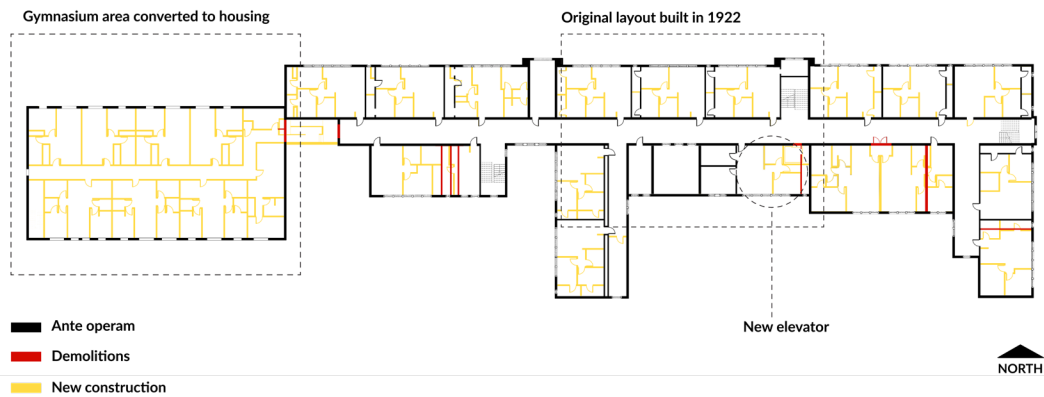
Second floor demolition and new construction plans of Dunbar Commons. Source: Authors.
